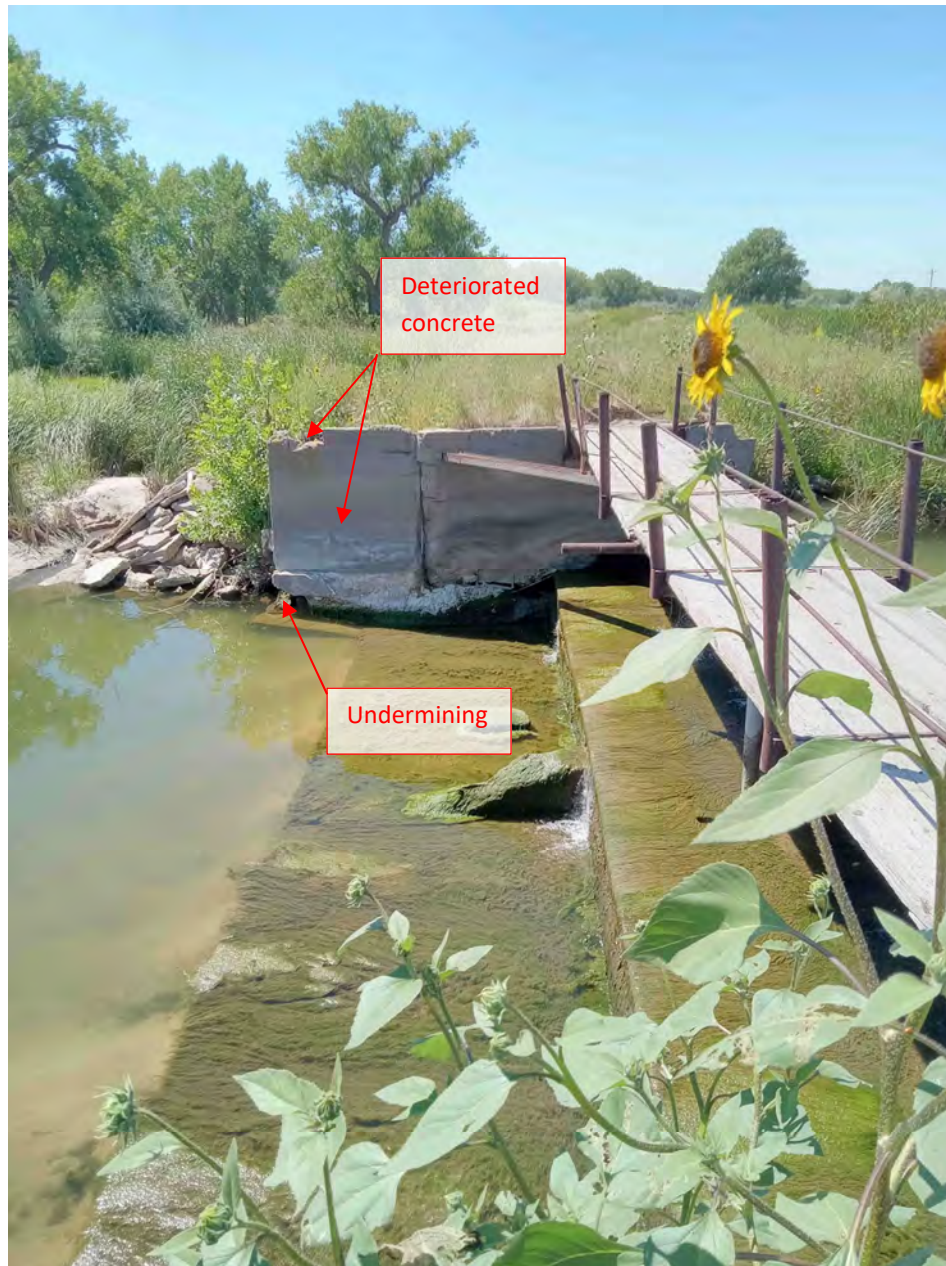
Structure floor and downstream scour pad (from north abutment).
